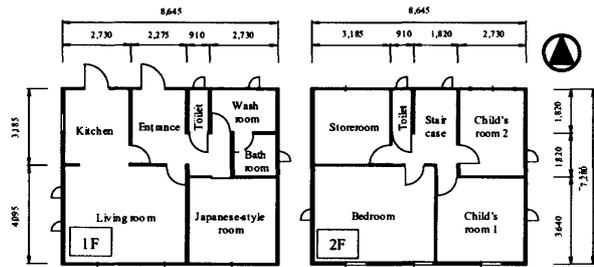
Plan of the Standard Residential House Model Proposed by the Architectural Institute of Japan.
